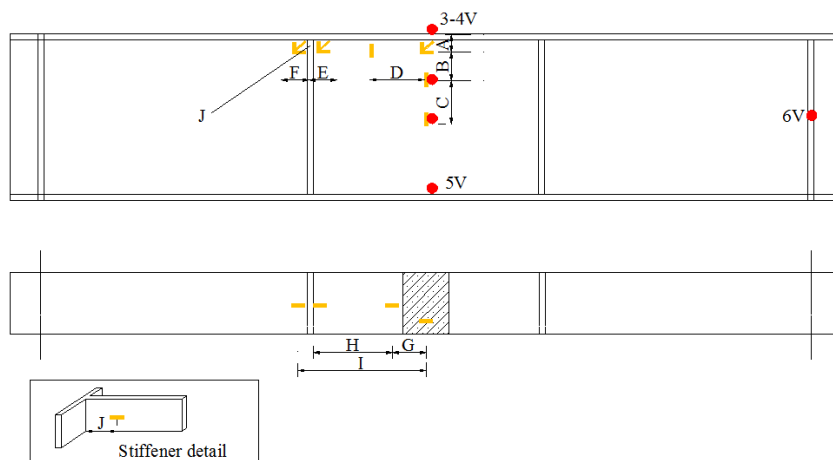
Instrumentation. Frontal and top views of tested girders $a/h_w < 2$
